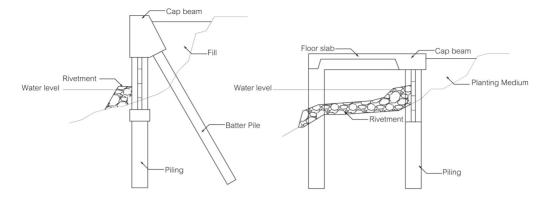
Batter piling channel bank armor (left) and platform piling channel bank armor
